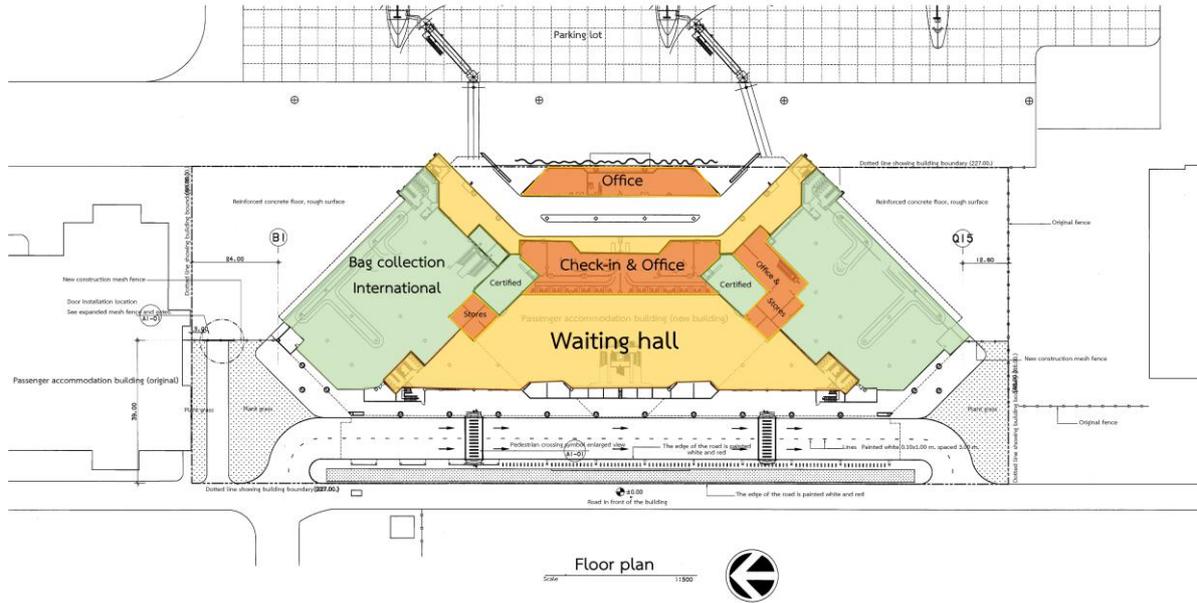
Layout of Terminal 2 (1st Floor)
